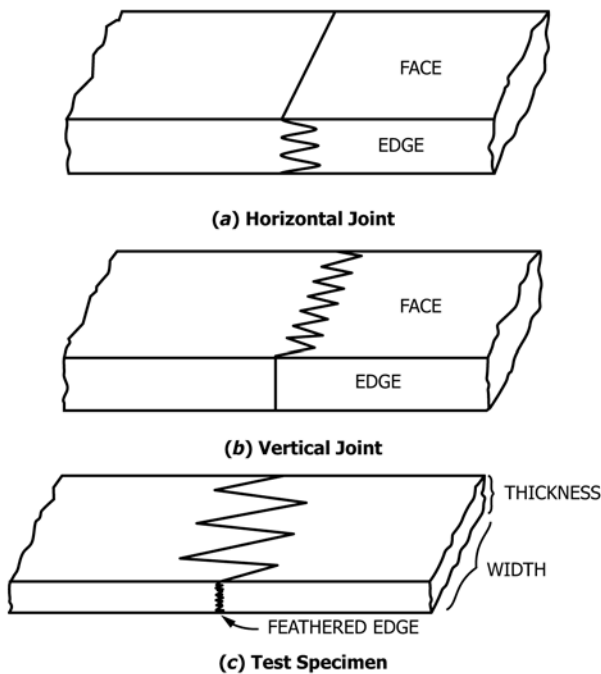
Finger Joint Assembly and Specimen Descriptions
